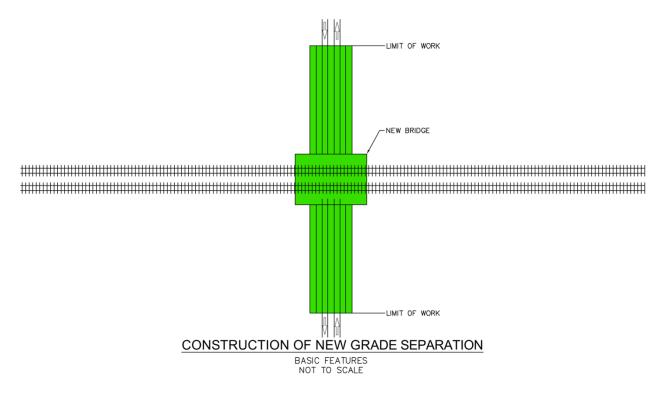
Typical Configuration – Construction of Grade Separation Improvements
